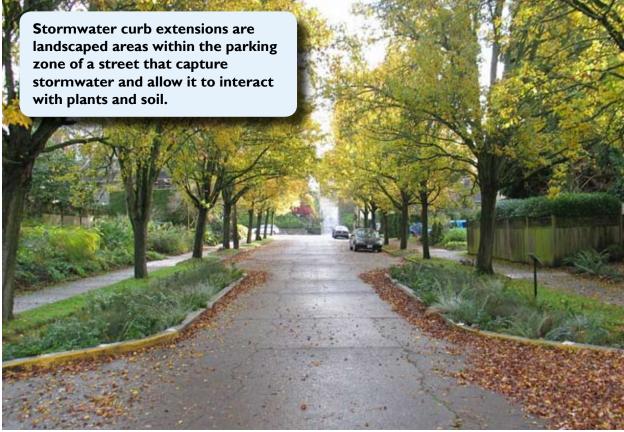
Stormwater curb extensions used on a residential street in Portland, Oregon.
